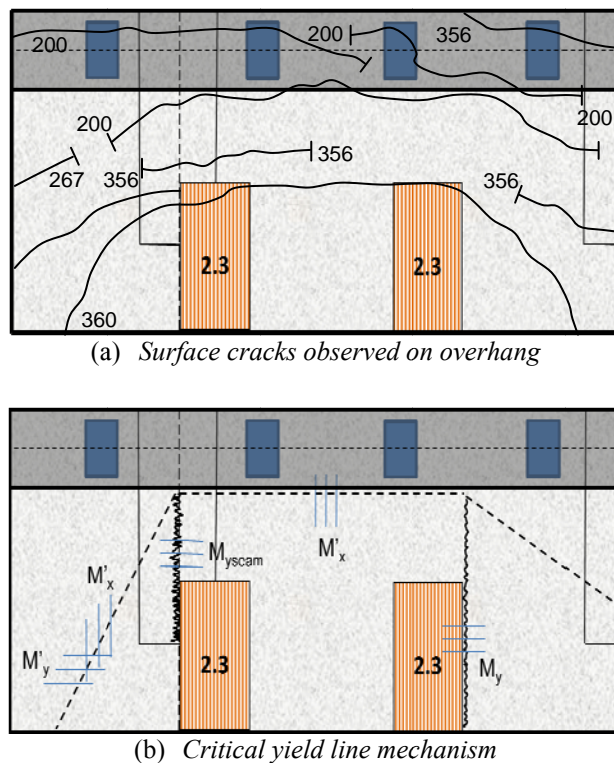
Load Case 2.3; surface cracks and critical failure mode for precast prestressed overhang with tandem axle load
